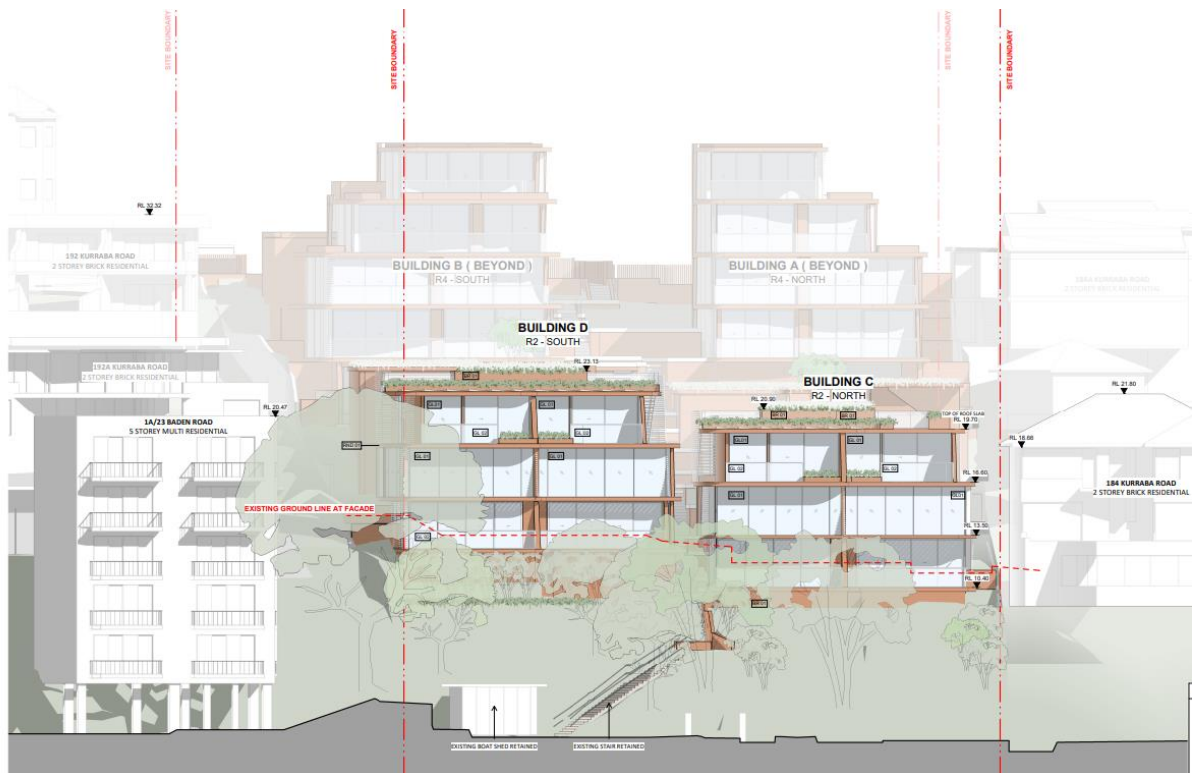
Drawing A201 - East Elevation (Source: KTA)
